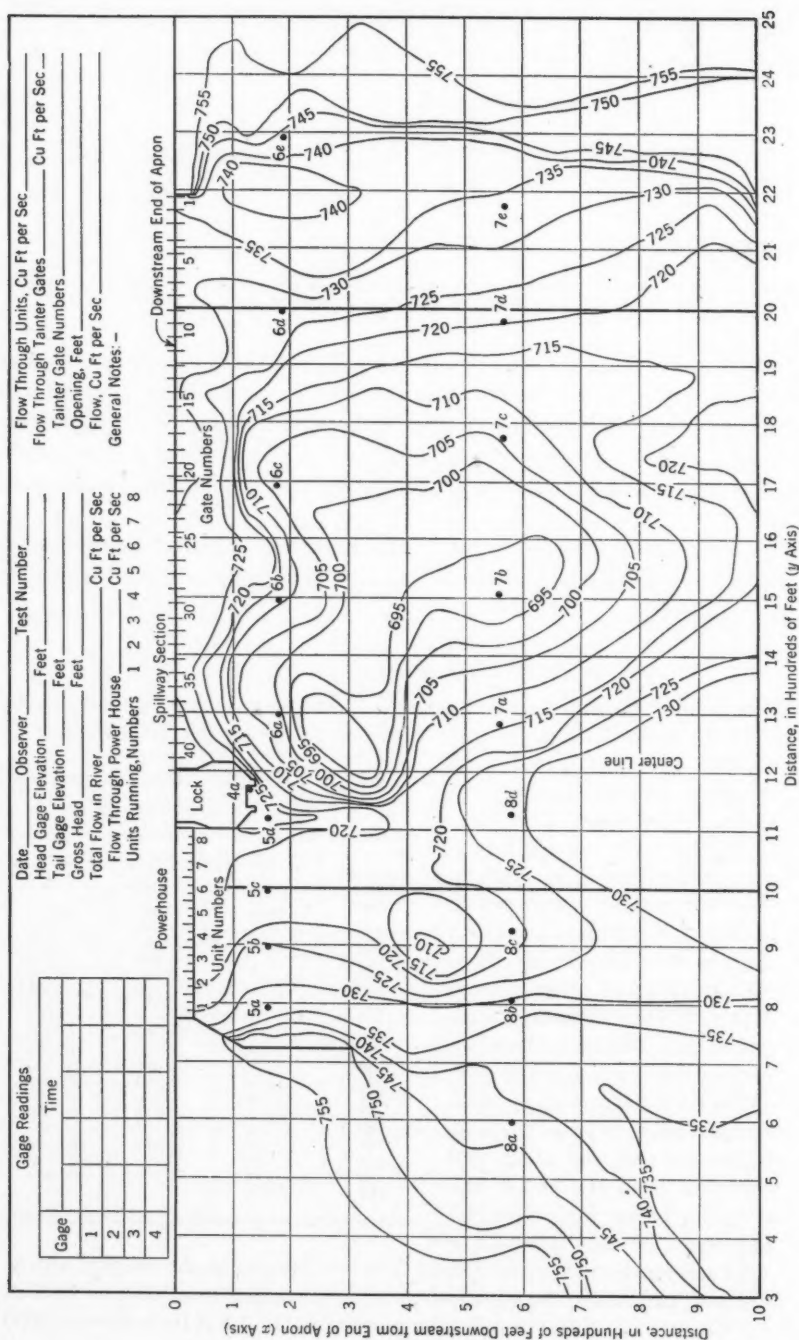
FORM SHEET AND GENERAL CONTOUR PLAN OF RIVER BOTTOM AS OF 1932
